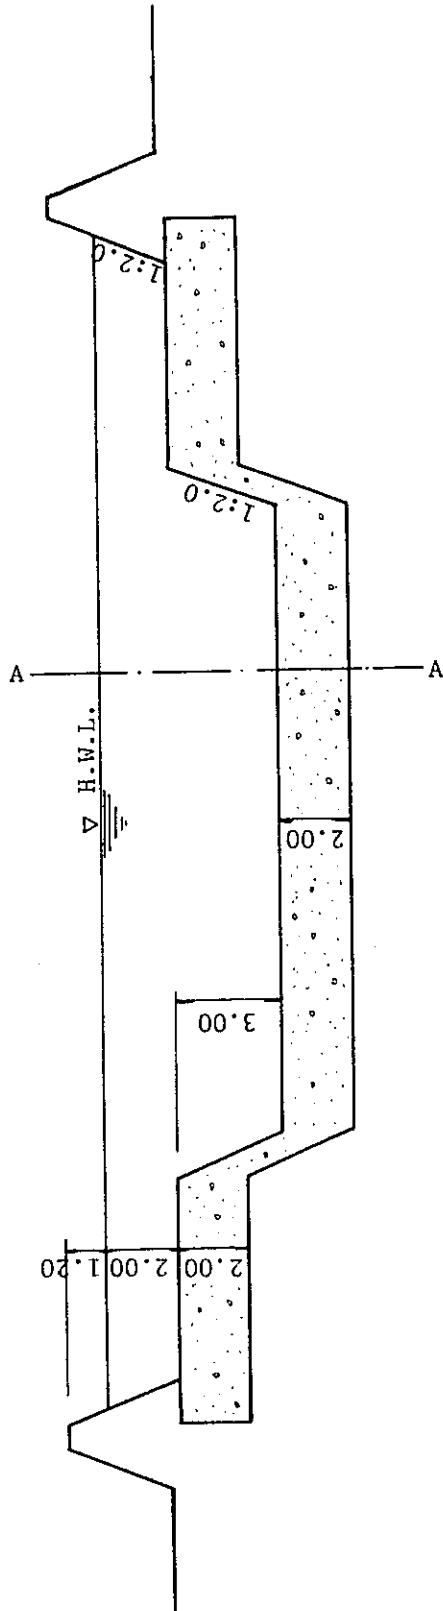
CROSS-SECTION OF GROUND SILL
